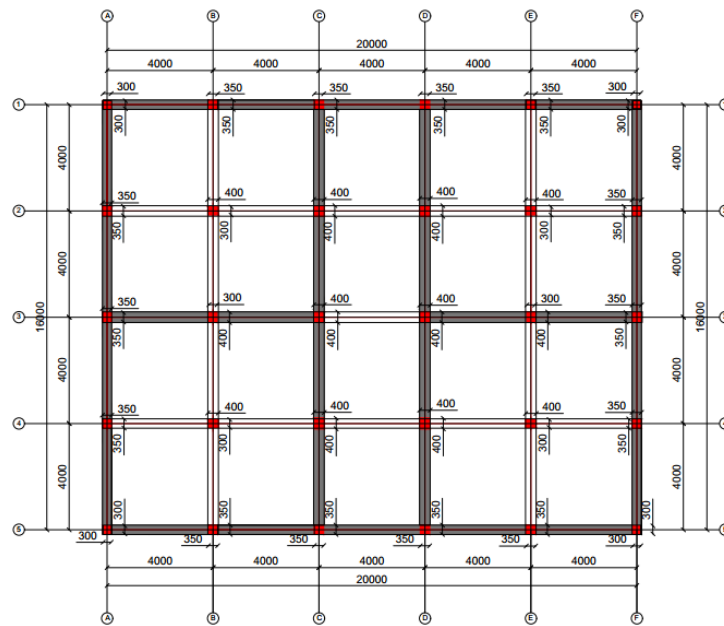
Structural plan view of the 3-story frame (units in mm).
